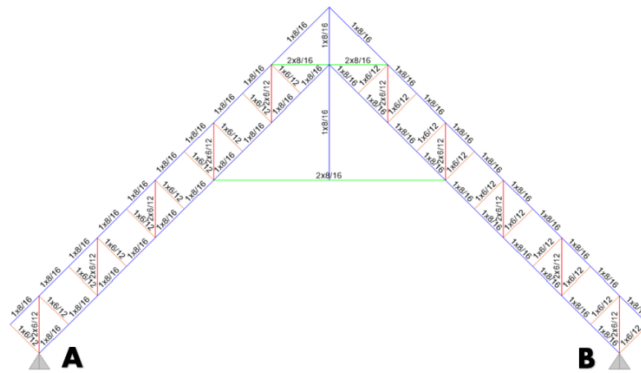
Configuration of The Existing Wooden Roof Truss With Solid Wood Of 80x160 & 60x120
